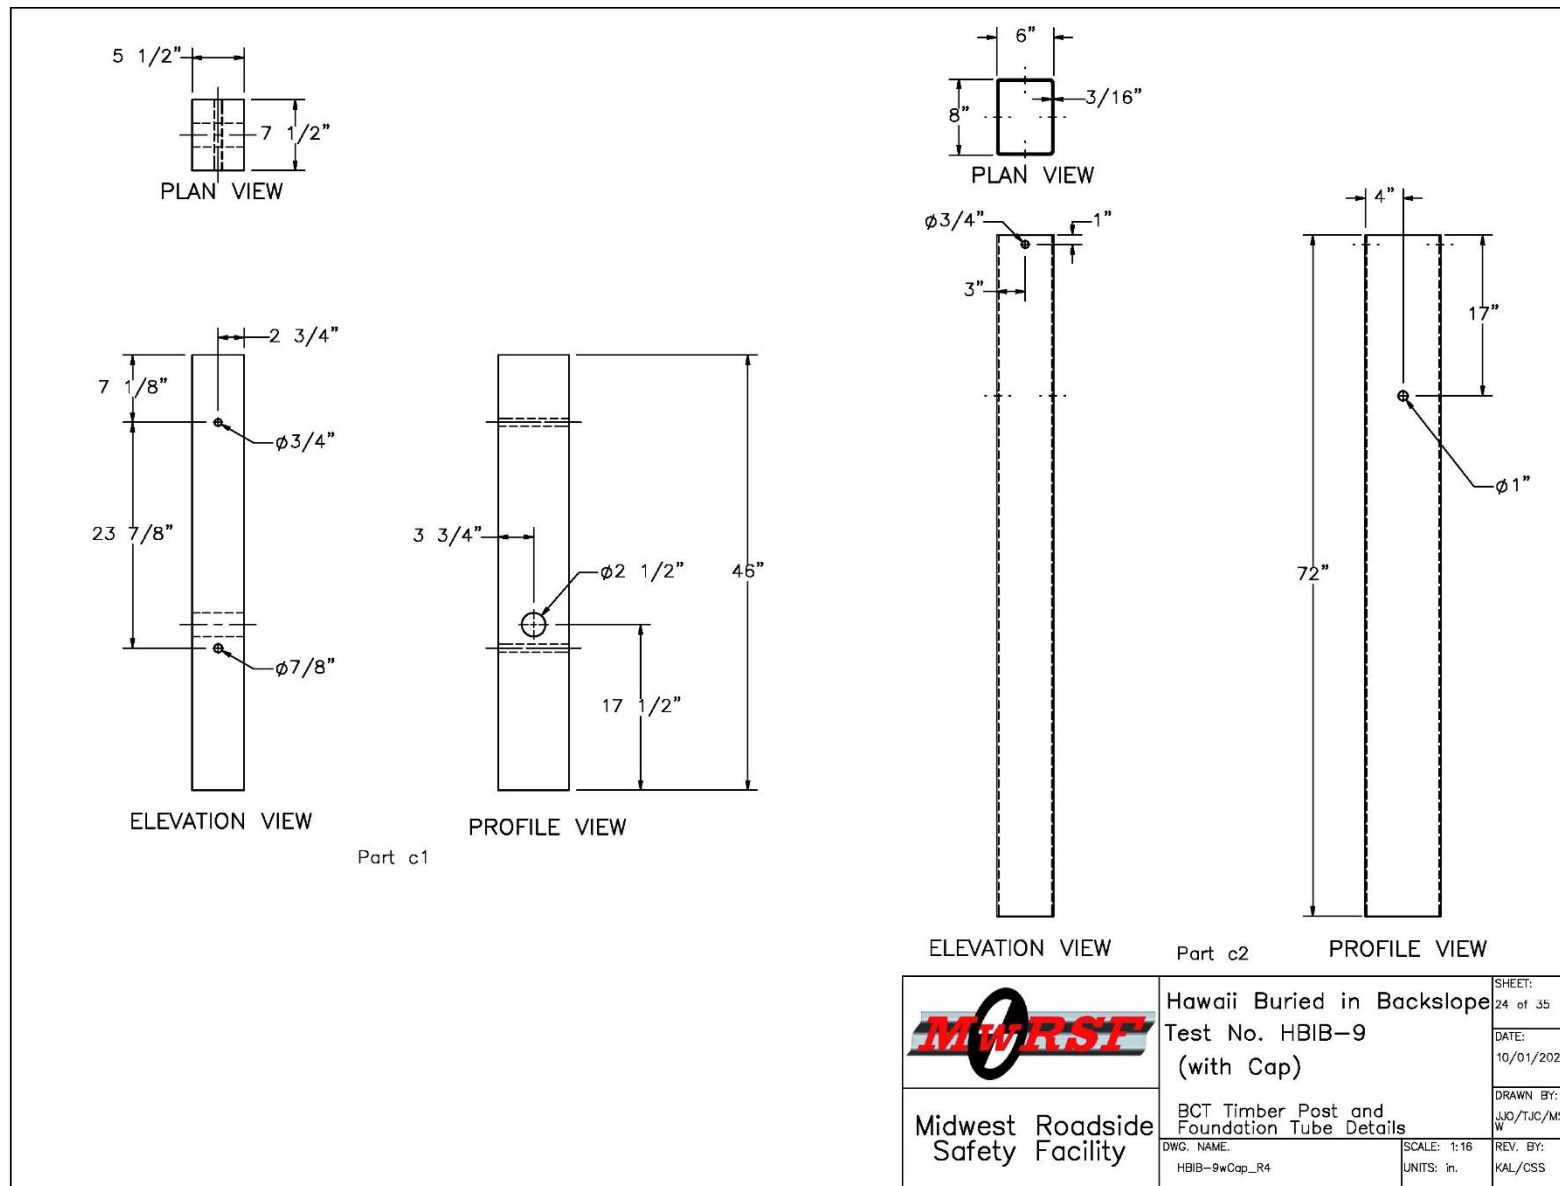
BCT Timber Post and Foundation Tube Details, Test No. HBIB-9
